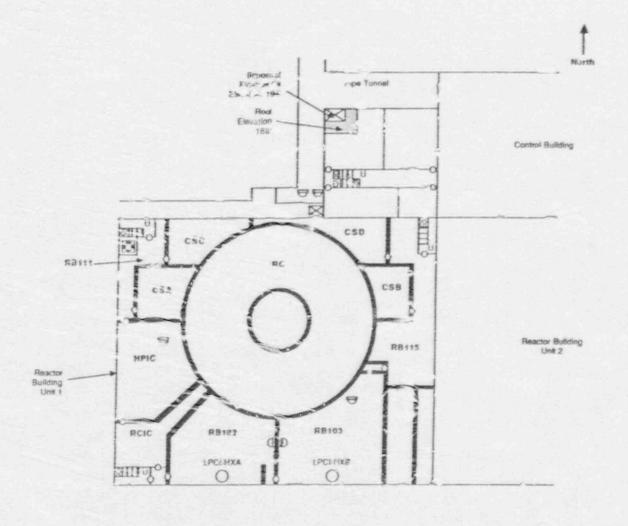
Limerick 1 General Arrangement, Elevation 177'
